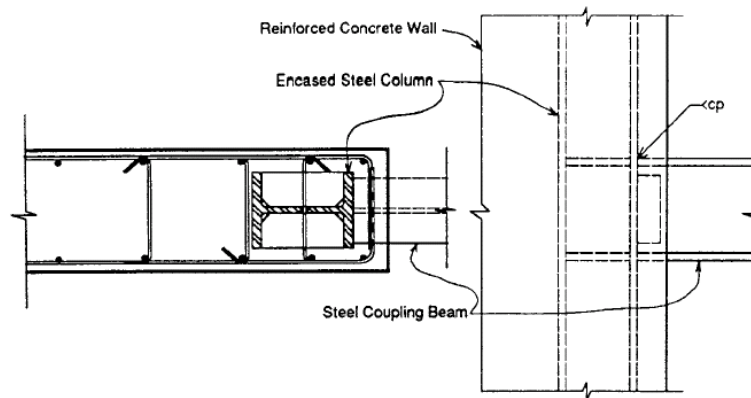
Steel coupling beam to reinforced concrete wall with composite boundary member.
